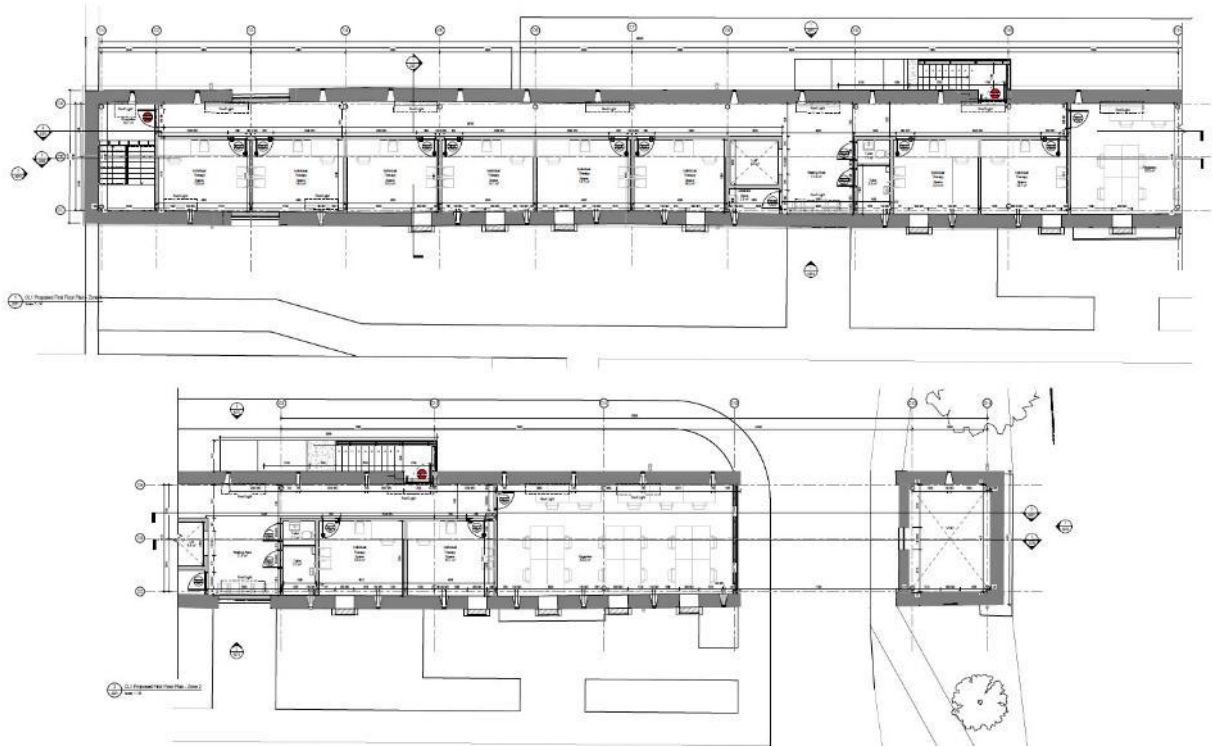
Proposed first floor plan. Above: Part 1. Bottom: Part 2.
